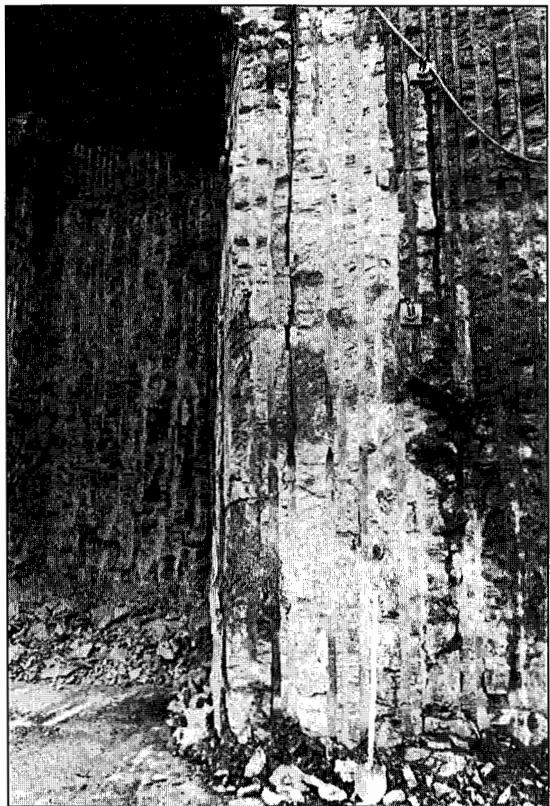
A view of the excavation limits at the stairway area that was blasted inside Stimpson Hall, showing the opened "dip" joint at the right side corner. A rock block at the top was removed from this area.
